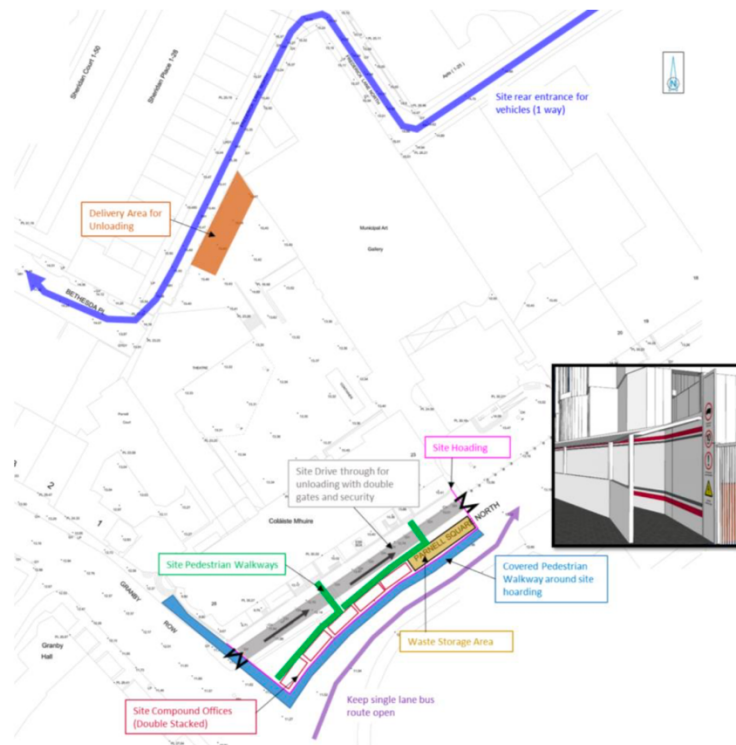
Location of Construction Compounds and Site Deliveries. (Source: Figure 12 of Construction Transport Management Plan, prepared by Arup.)
